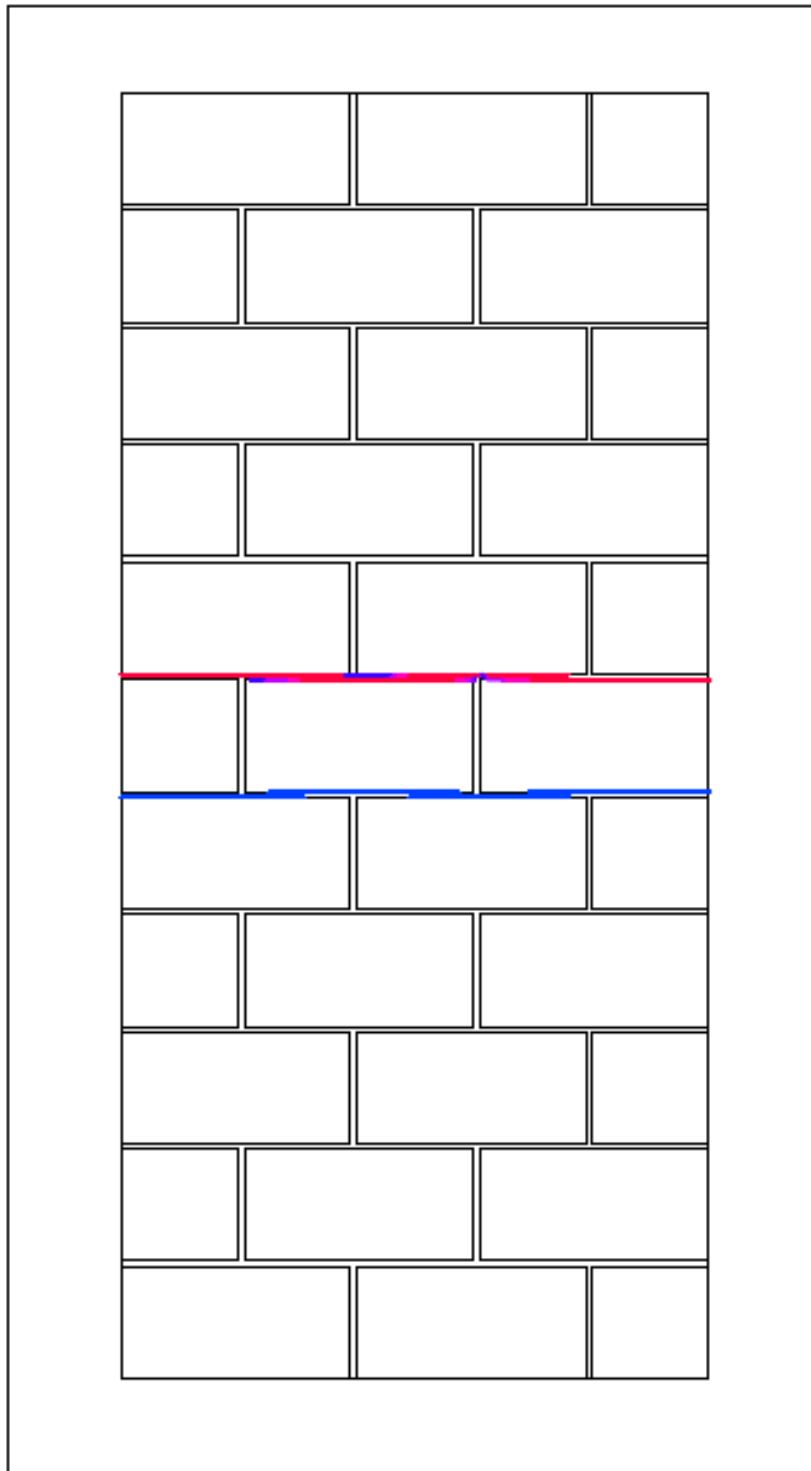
Cracking Pattern of B-1 2.2m Wall
